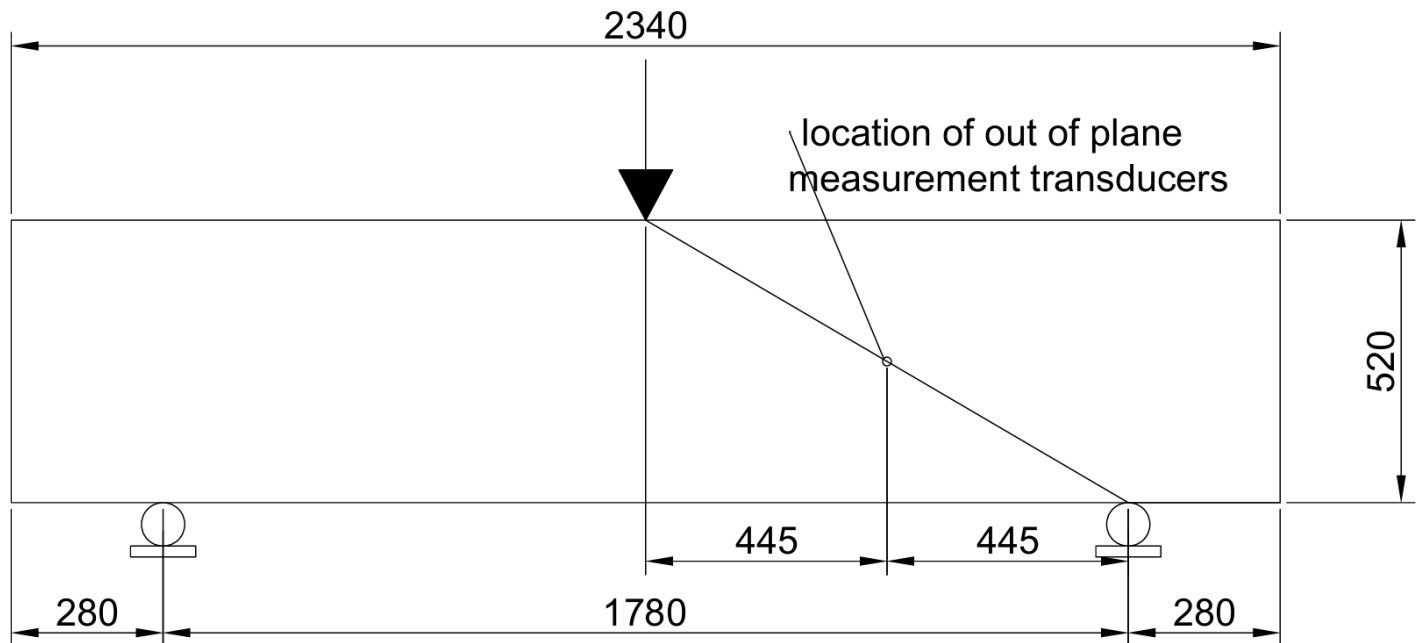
Sketch Out of Plane Deformation Measurement Locations
